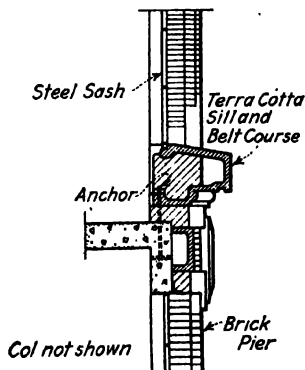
Terra cotta sill and belt course on brick spandrel anchored to concrete spandrel girder.
